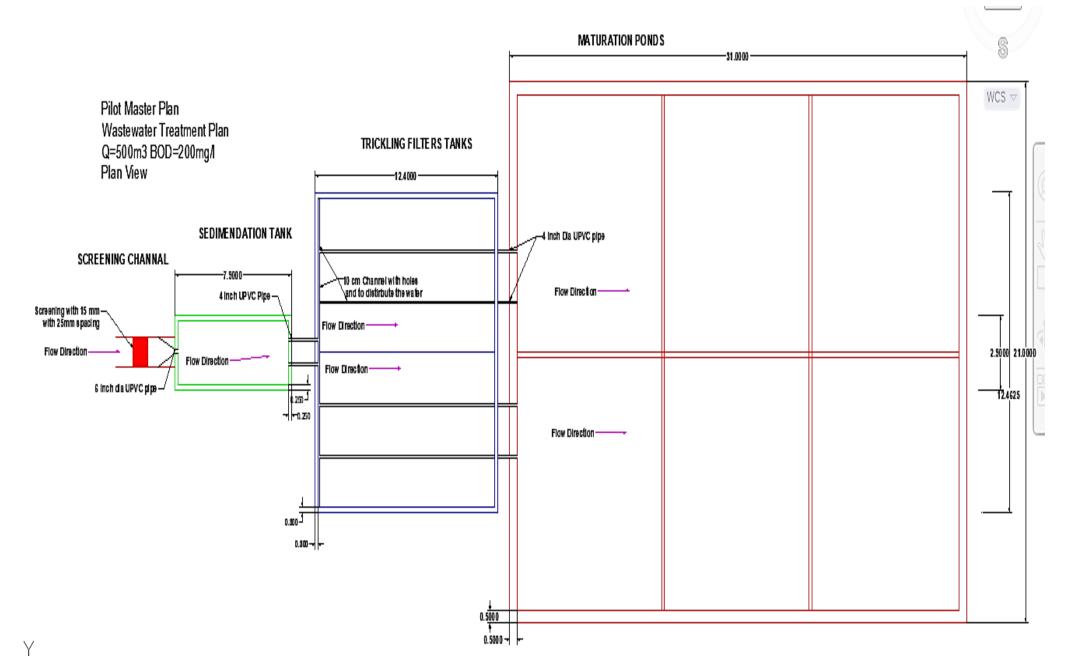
Plan View of Pilot Master Plan for the Proposed WWTP outside the Faculty of Engineering - Source Own Representative
